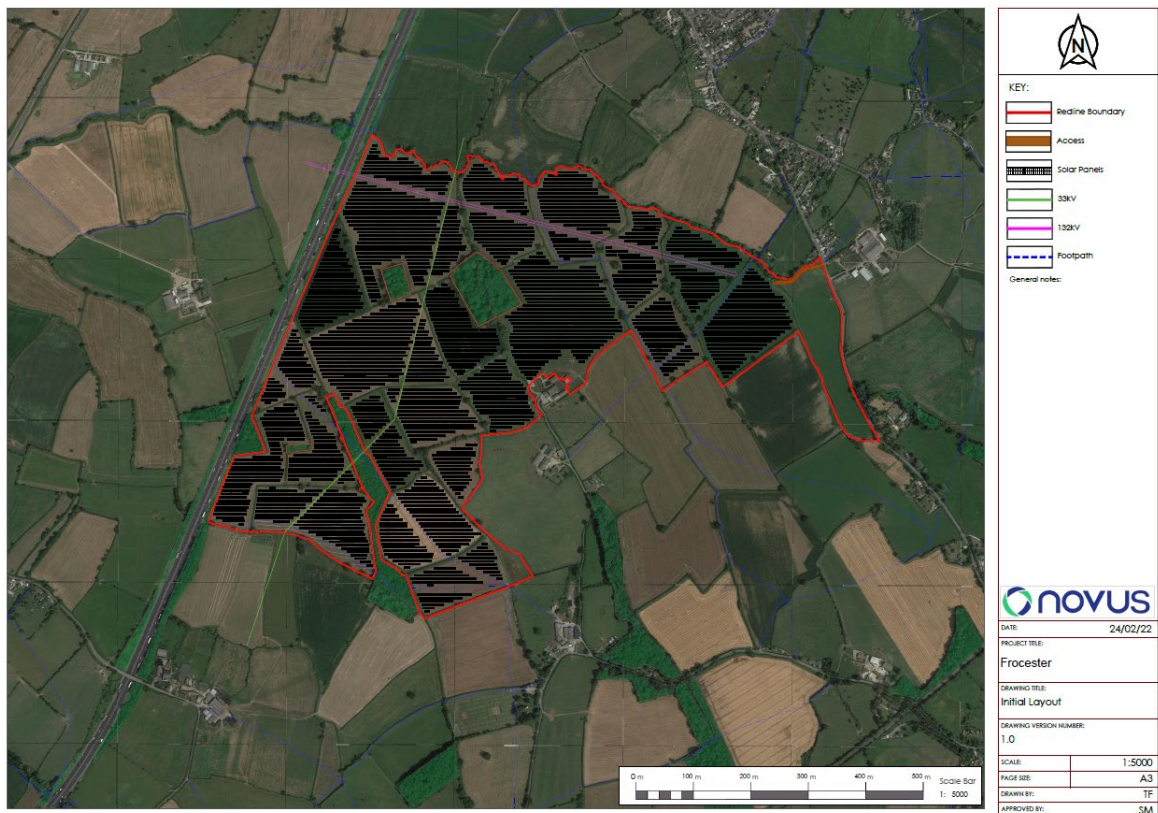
Indicative layout - The solar farm will be connected directly to the overhead powerline which crosses the Site, providing an efficient connection and avoiding the need for new overhead lines or new cabling work off site.
